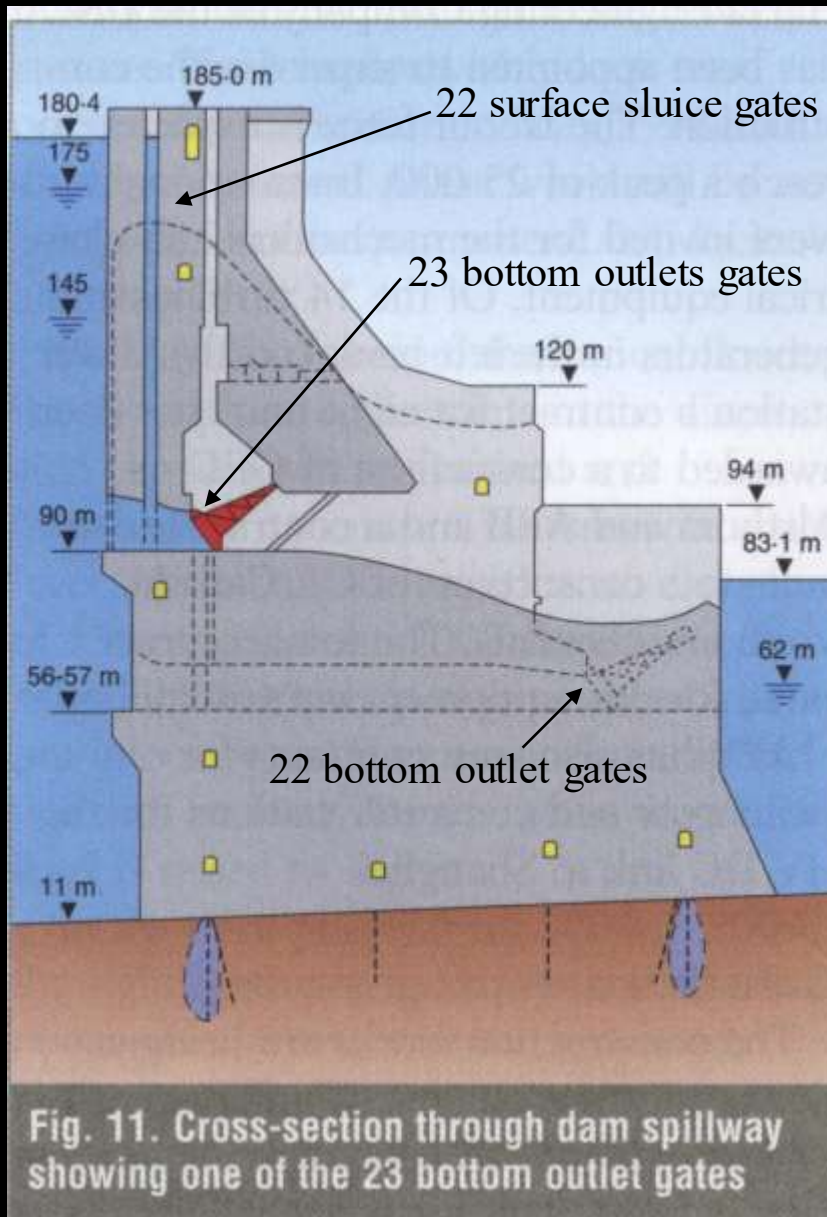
Cross-section through dam spillway showing one of the 23 bottom outlet gates
